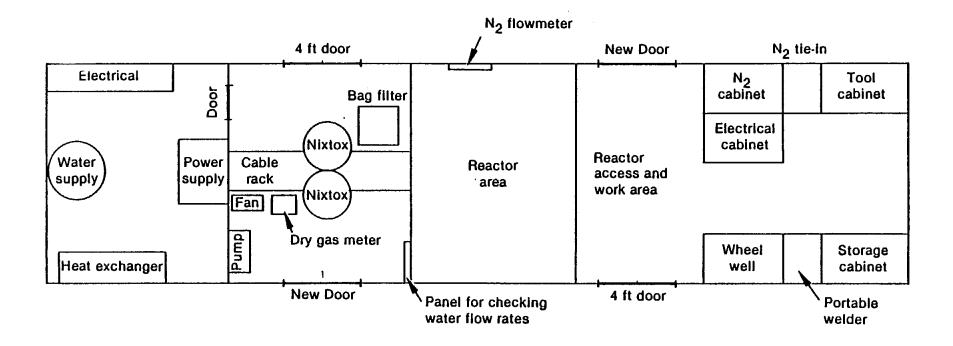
Plan View of AER3 Trailer Equipment Layout.
